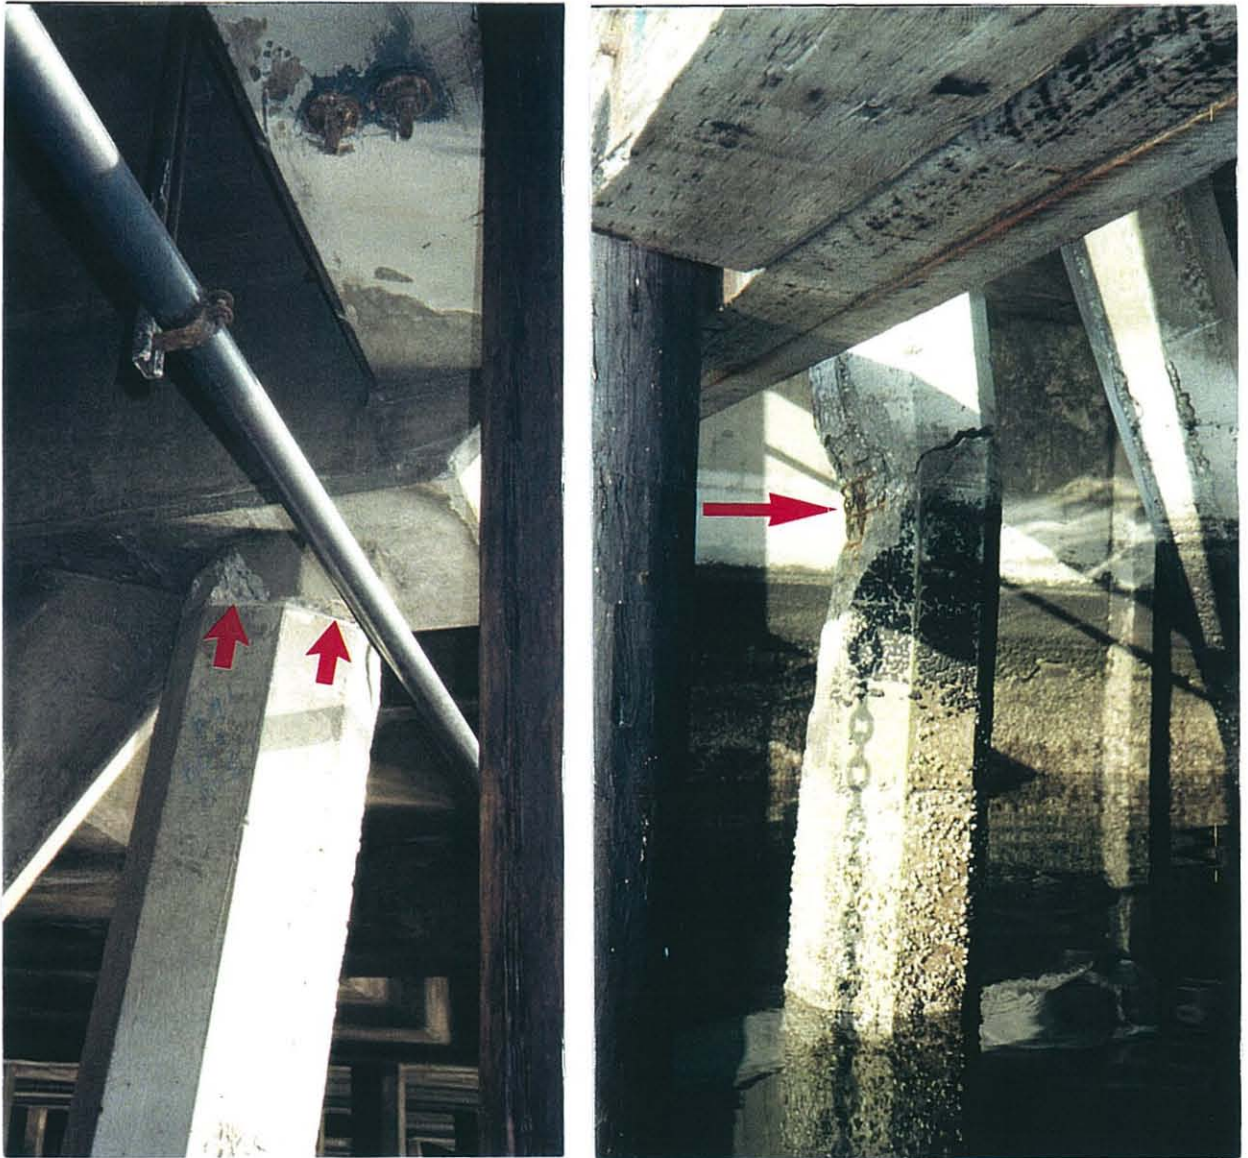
Breakage of front row pile due to vessel impact. Breakage is immediately below pile/cap connection (left) and immediately above MHW (right).
